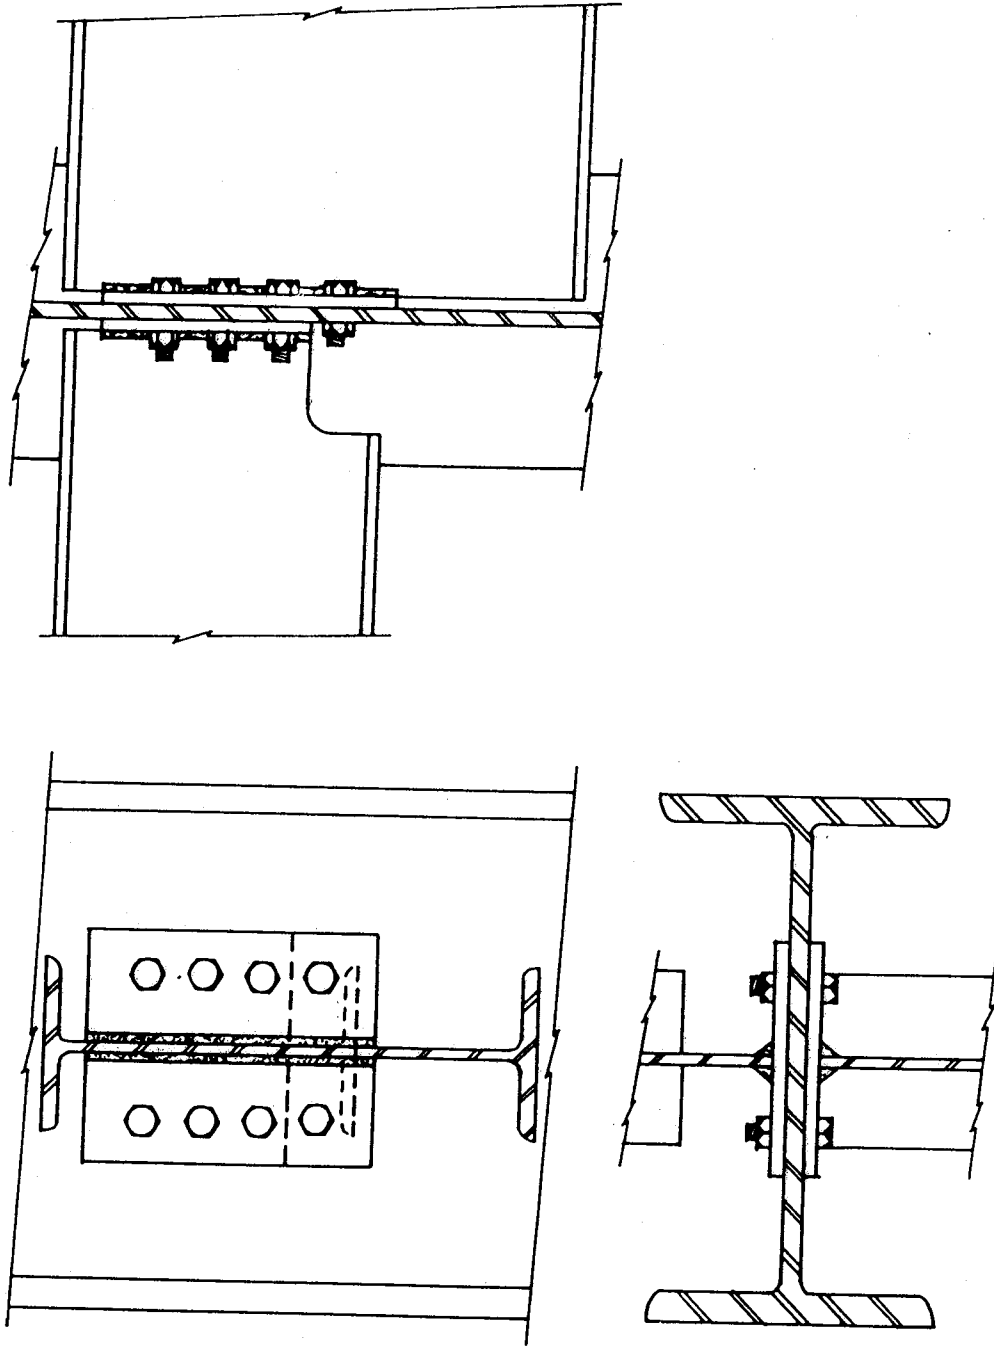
Double Flexible End Plate Connection to Column Web Detail
